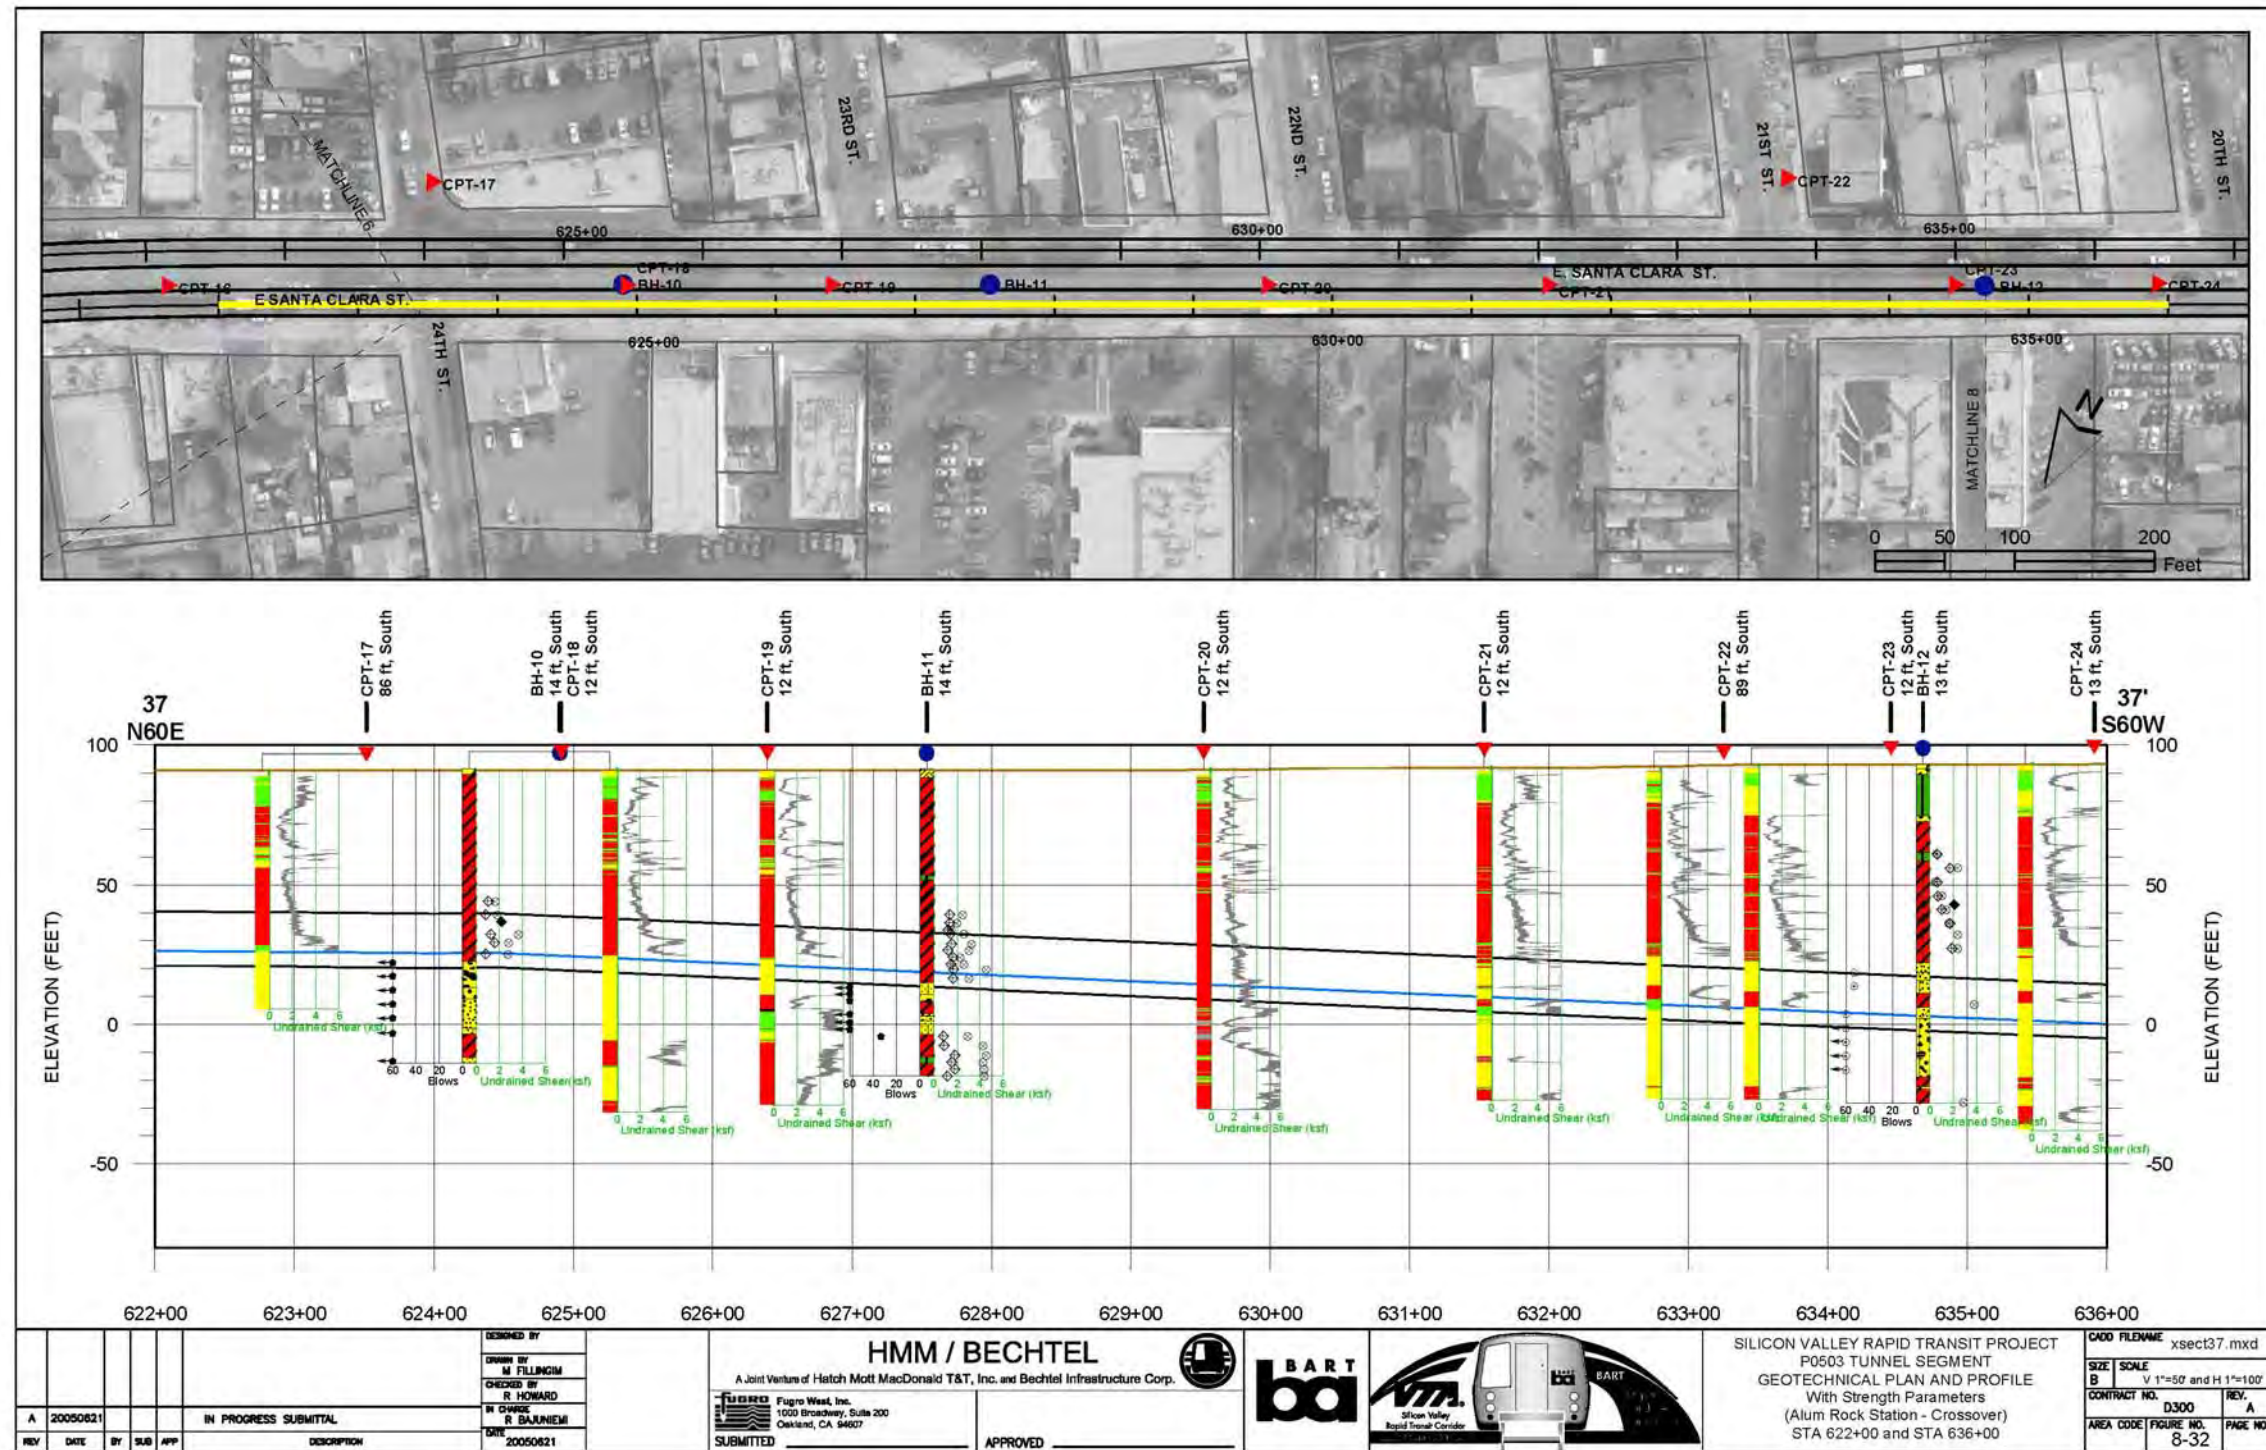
Geotechnical Plan and Profile with Strength Parameters: 622+00 to 636+00.
